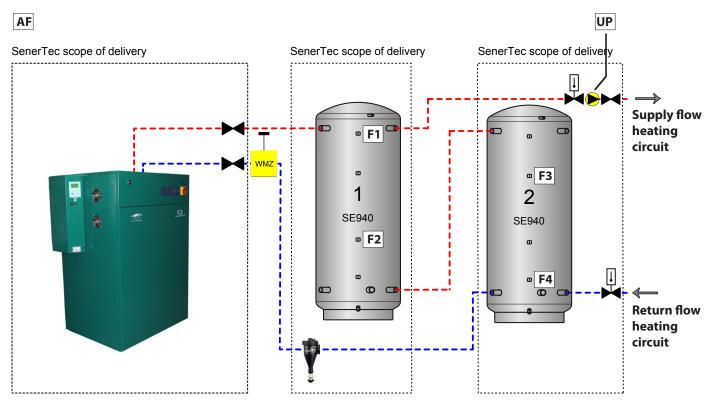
Hydraulic connection diagram - Dachs Pro 20 ST
